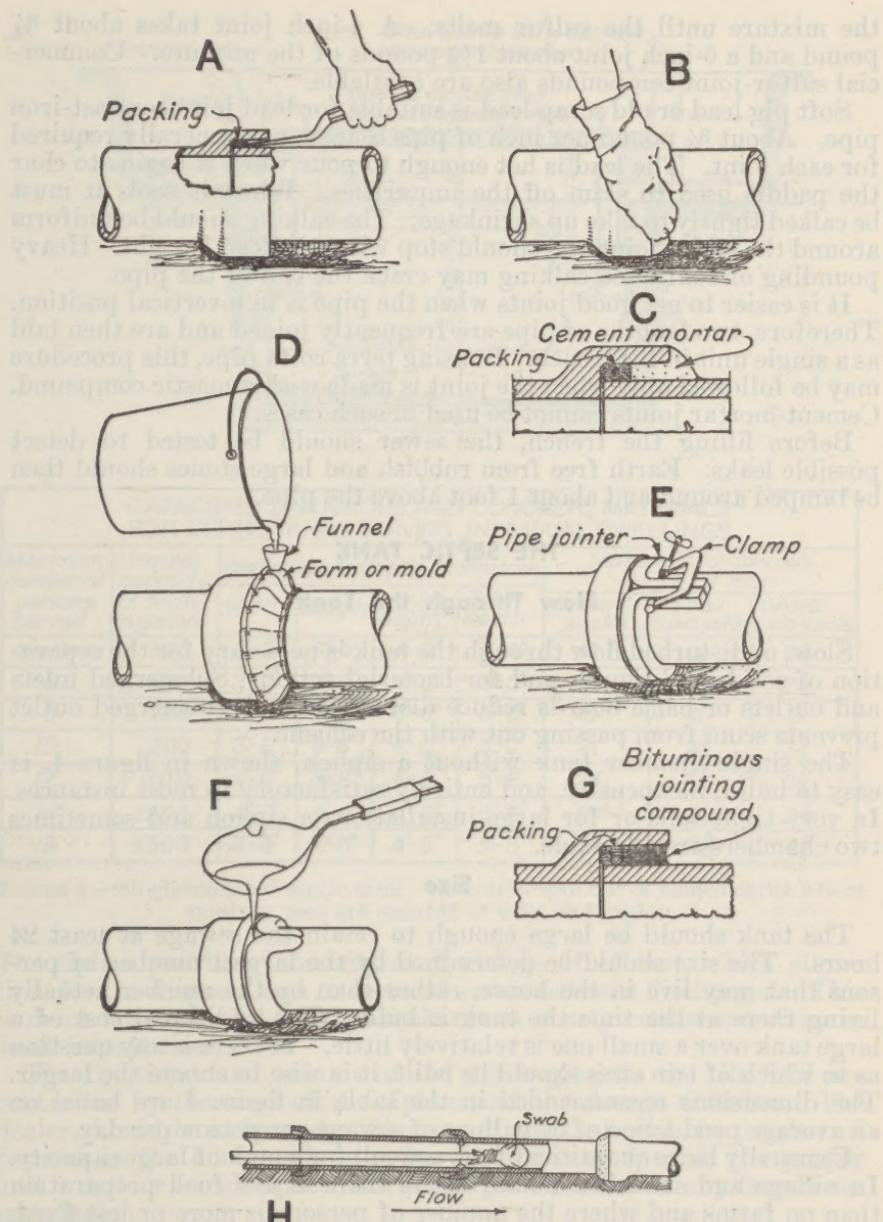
Jointing sewer pipe. *A*, Using calking iron to force packing into joint. *B*, Making joint with 1:2 portland cement mortar. Use only enough water to dampen the mix. Recalk after half an hour, to close shrinkage cracks. *C*, The completed joint. Wrap finished joint with cloth and keep dampened, to aid curing. *D*, Joint made by pouring 1:1 portland cement grout of creamy consistency into a form. This type of joint is not feasible unless the metal forms shown are available. *E*, Use of asbestos runner clamped around pipe, for pouring hot joint. *F*, Clay roll used in place of asbestos runner. *G*, A completed bituminous joint. *H*, Use of swab, to remove any joint material forced through to inside of pipe.
